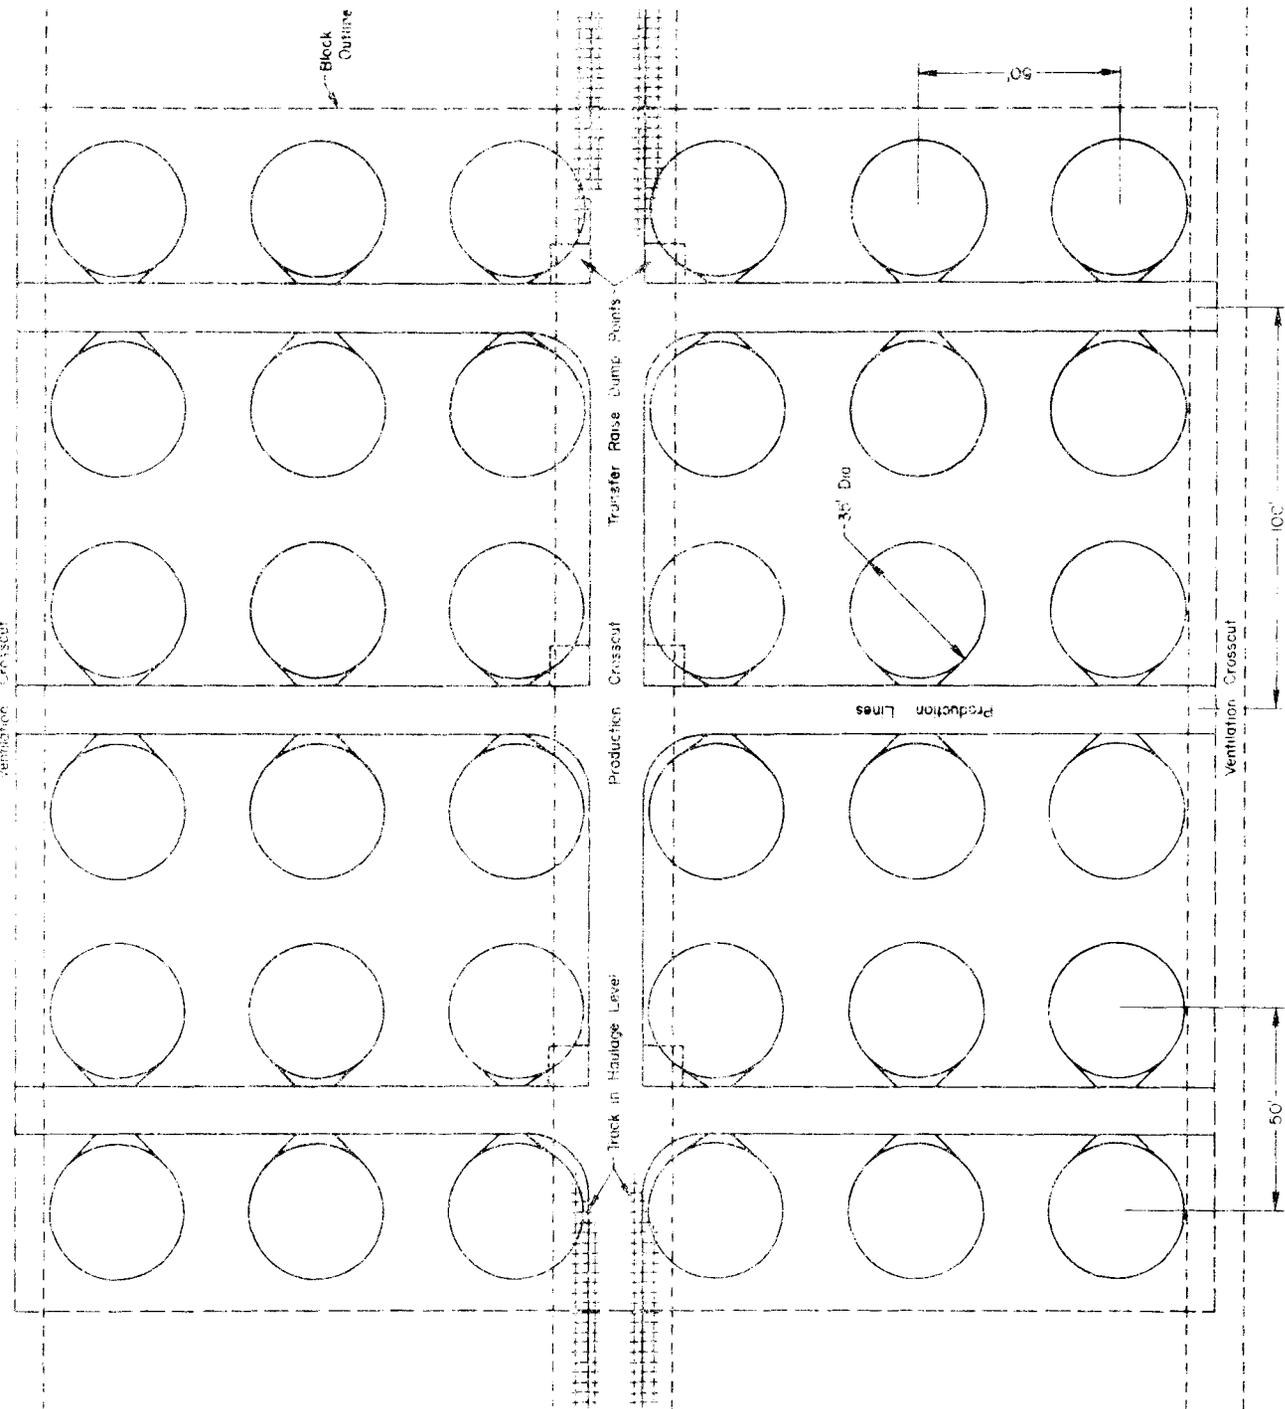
Plan View of Production Level, Block within a Panel, Block Caving with LHD's
